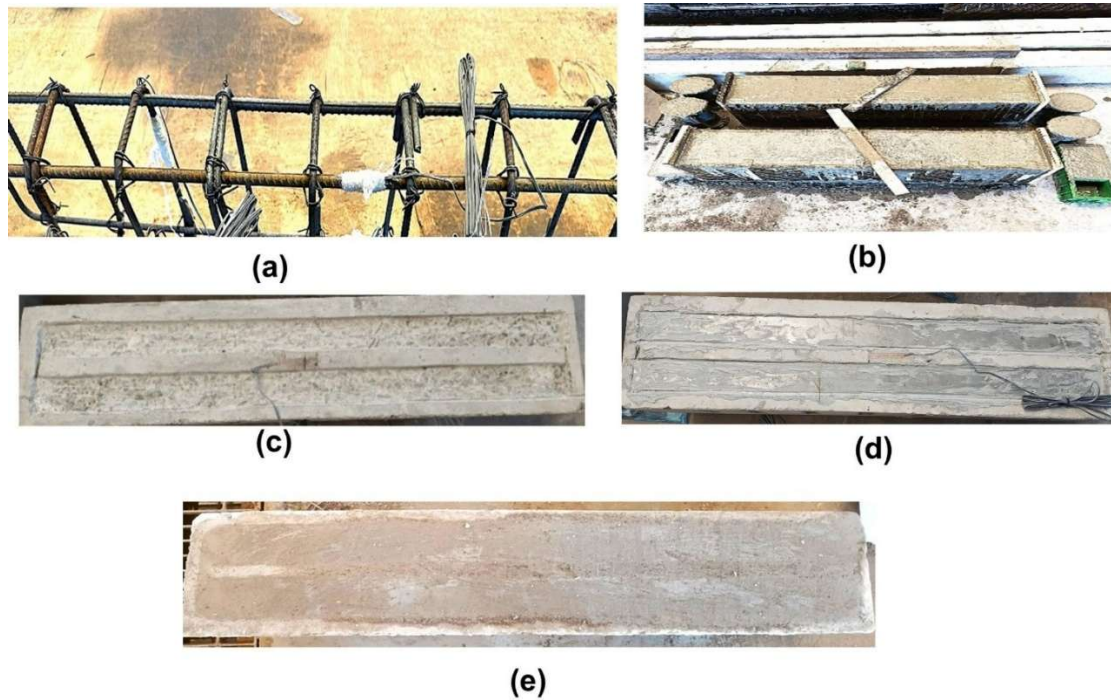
Specimen construction: (a) Reinforcement cage, (b) Beams casting, (c) Grooves cutting, (d) Bonding of strips and (e) Applying concrete cover
